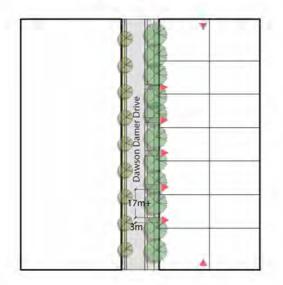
Indicative subdivision layout in the very low density area surrounding Oran Park House
